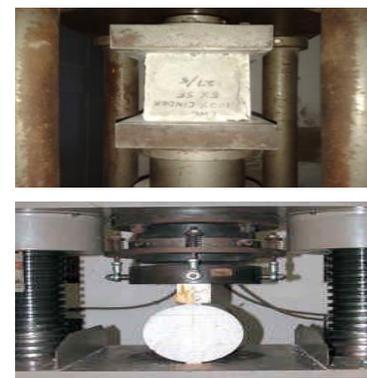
Testing of cube Plate 4.5 Testing of cylinder by split tensile
